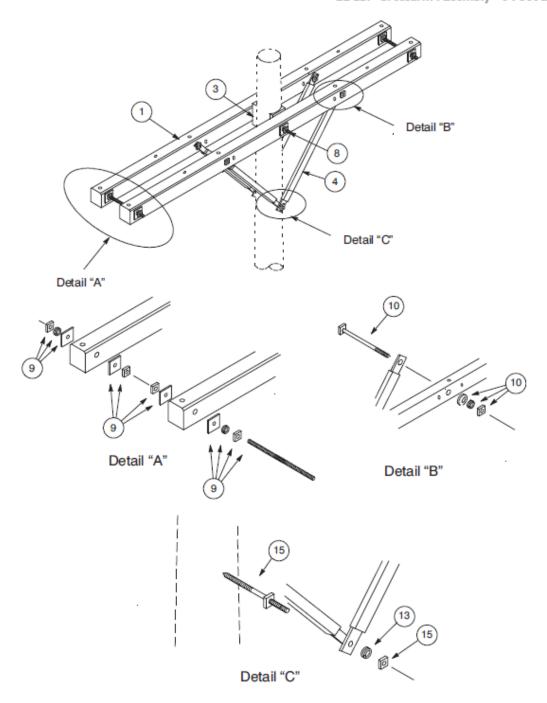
ft. Wood Crossarm Assembly, Flat Braces
